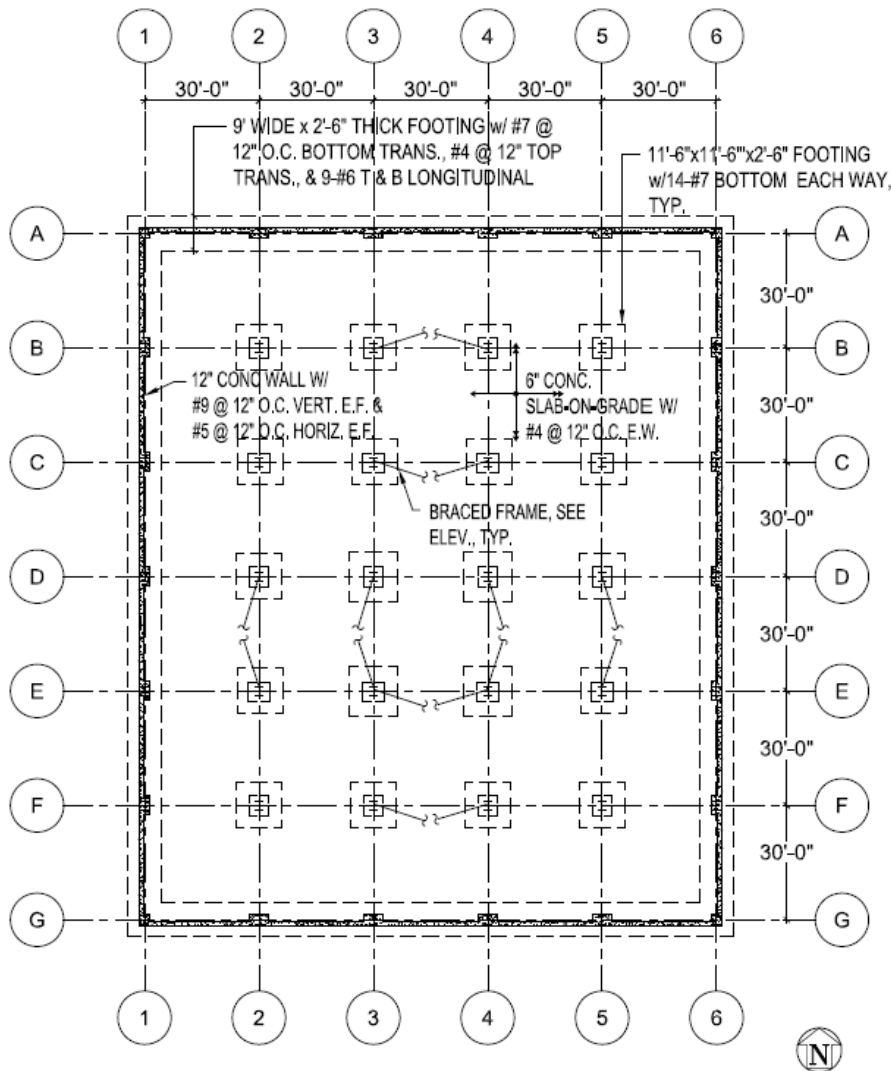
Hospital building foundation plan showing brace layout for seismic designs.
